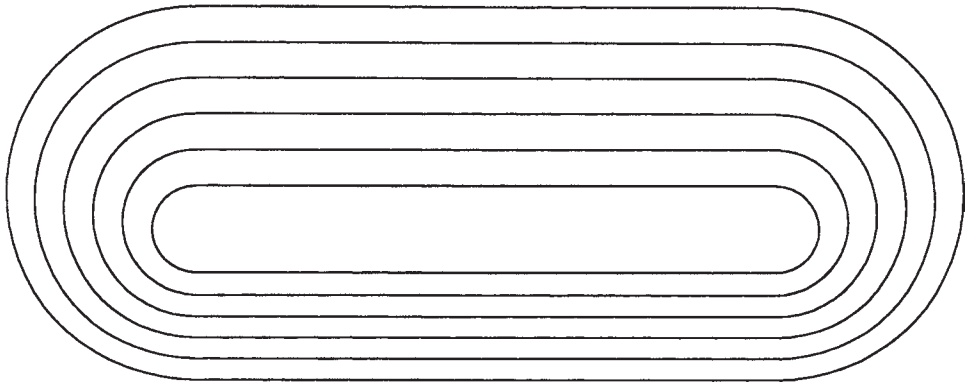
Plan view of a pit with different north and south wall slopes.
